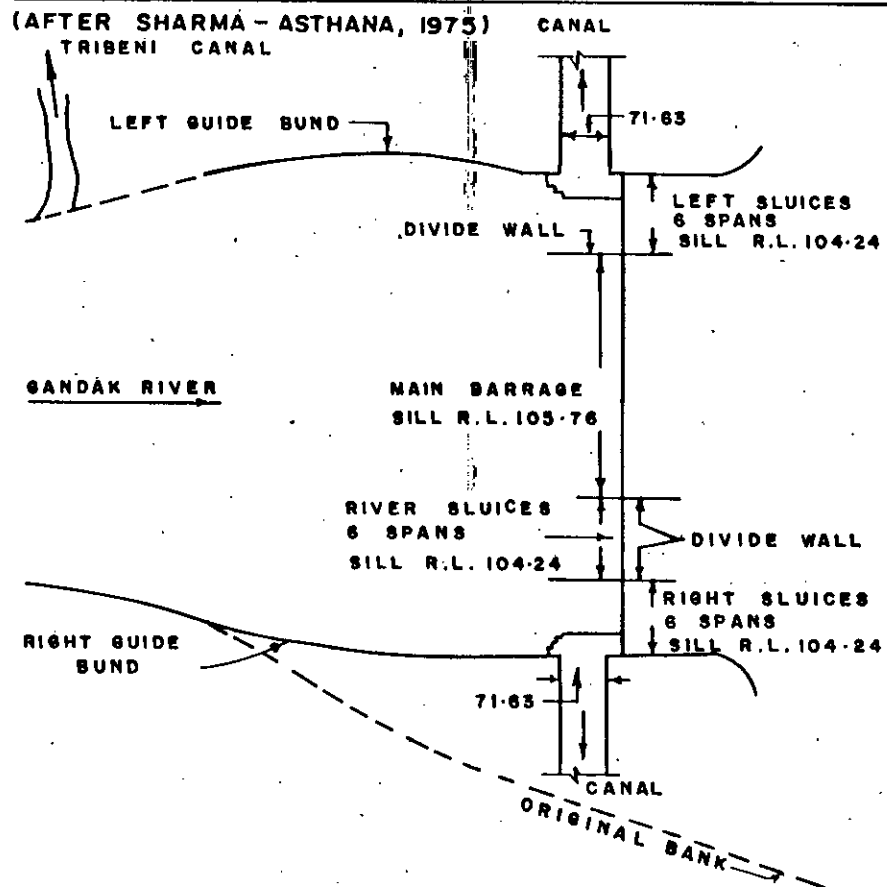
GANDAK BARRAGE SHOWING UNDERSLUICES,
